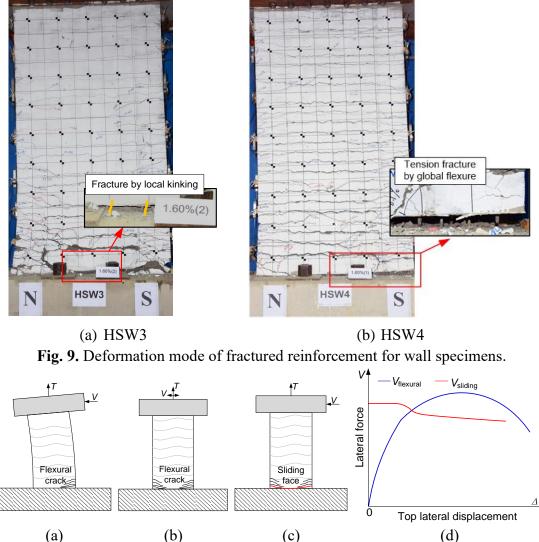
Schematic diagrams illustrating the mechanism of flexural-sliding failure. *Flexural failure:* Specimen HSW4 that had a normalized concrete tensile stress
